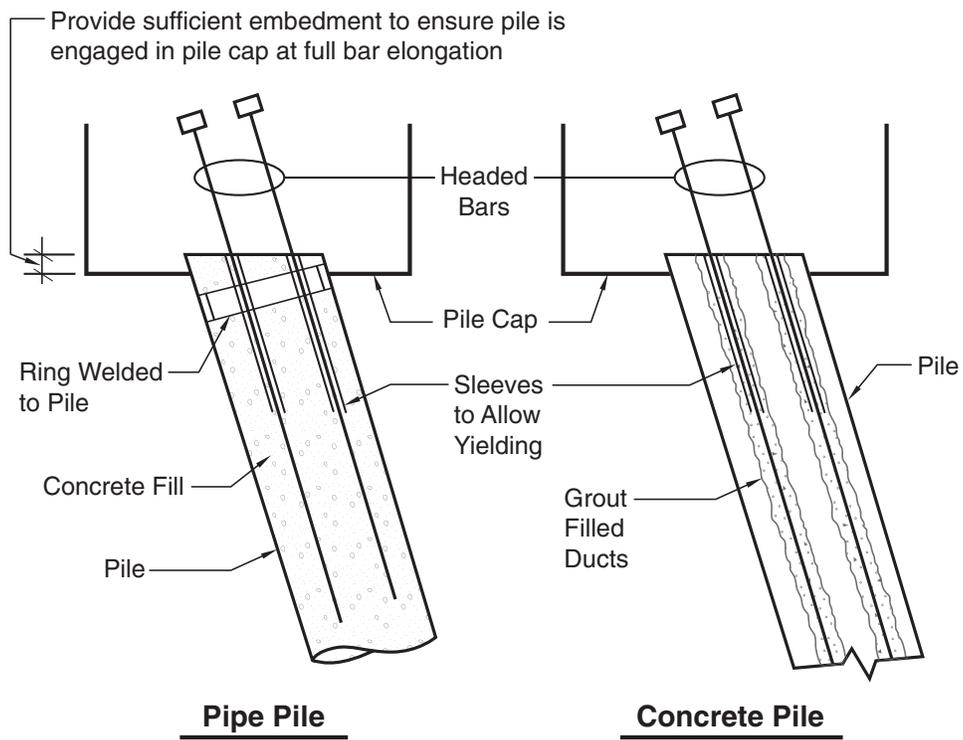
Sample Tension Fuse Details for Concrete and Pipe Piles
